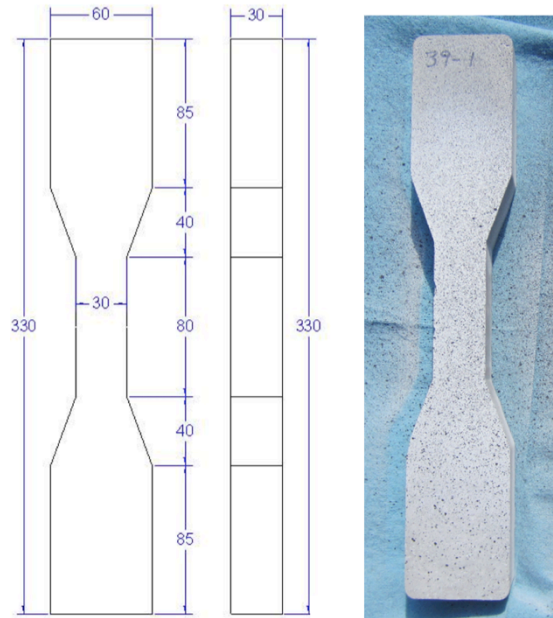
Dimensions for the direct uniaxial tension specimen (left) and a specimen prepared for testing with DIC (right)
